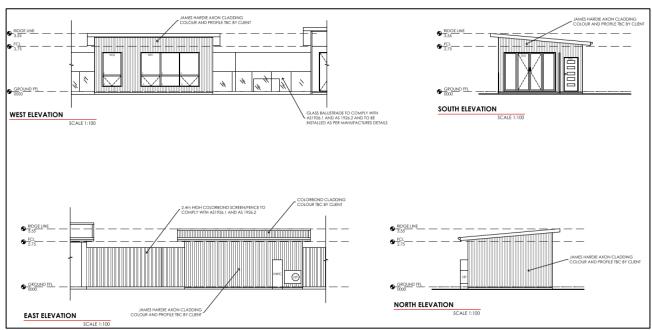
Unit 1 - elevations (Source: RFS Projects)
